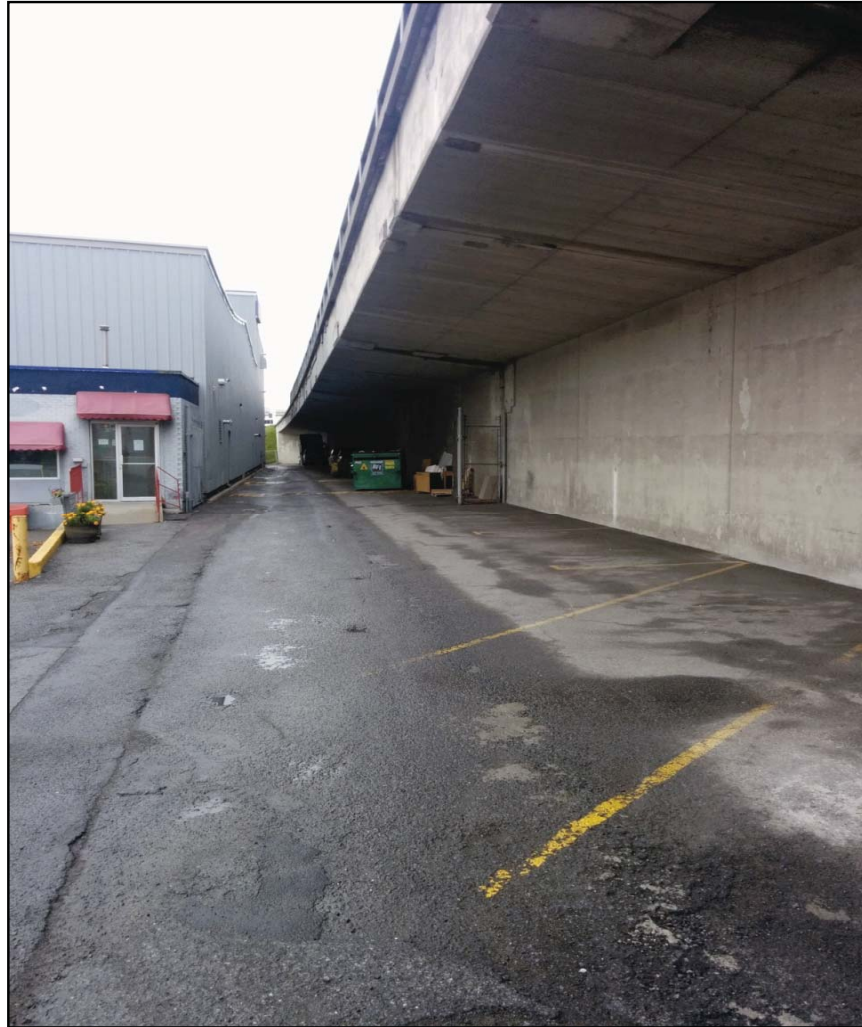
Bronson Avenue Retaining Wall (looking east, underneath cantilevered section)
